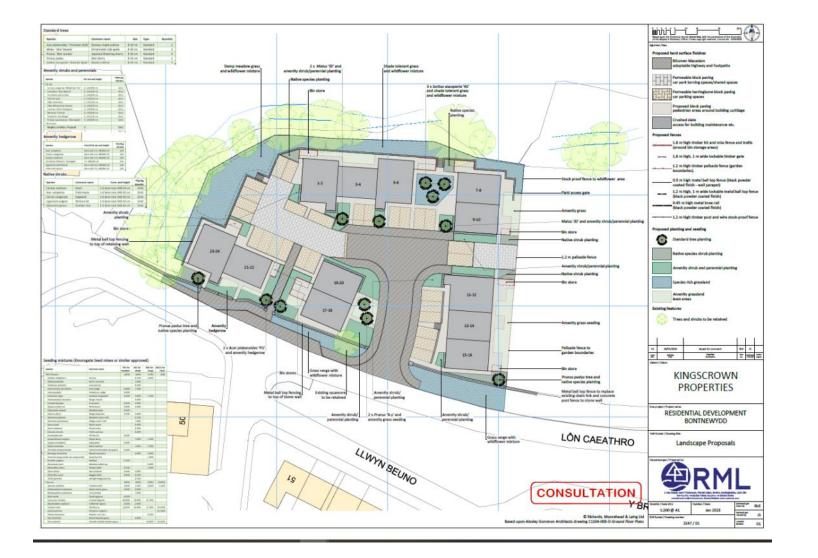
External Works Plan Image 02 - Proposed tree Elevation
